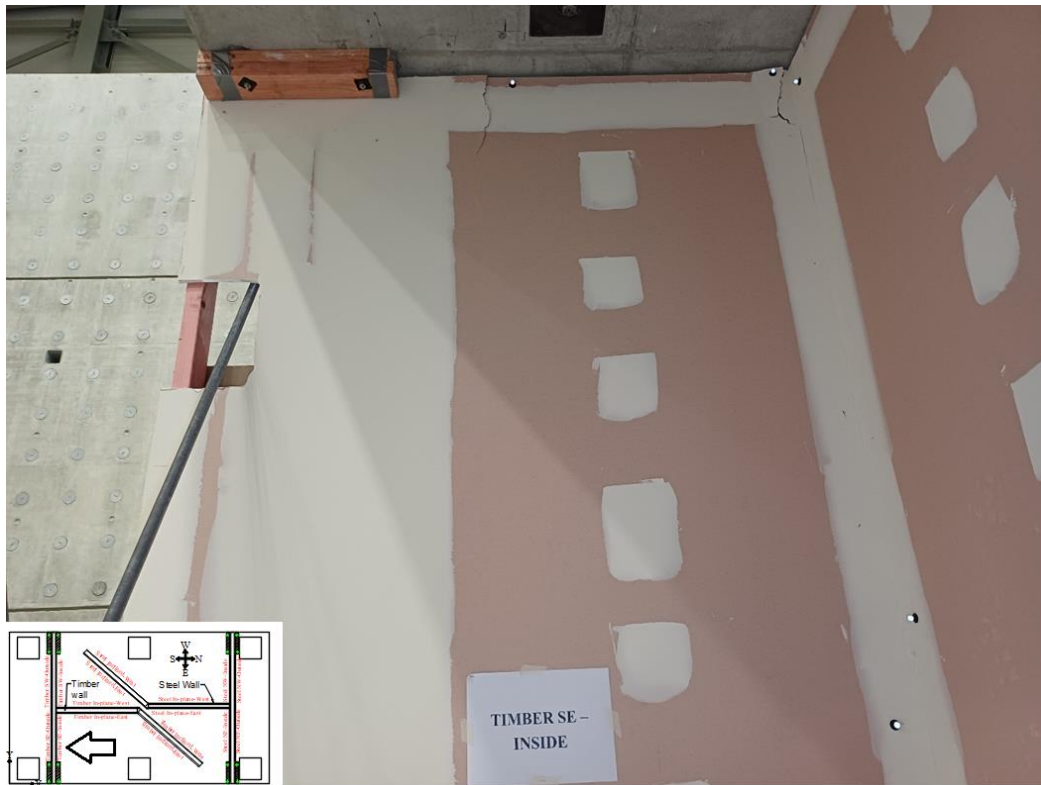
Timber Southeast Inside wall after motion 18 - 3 % inter-storey drift
